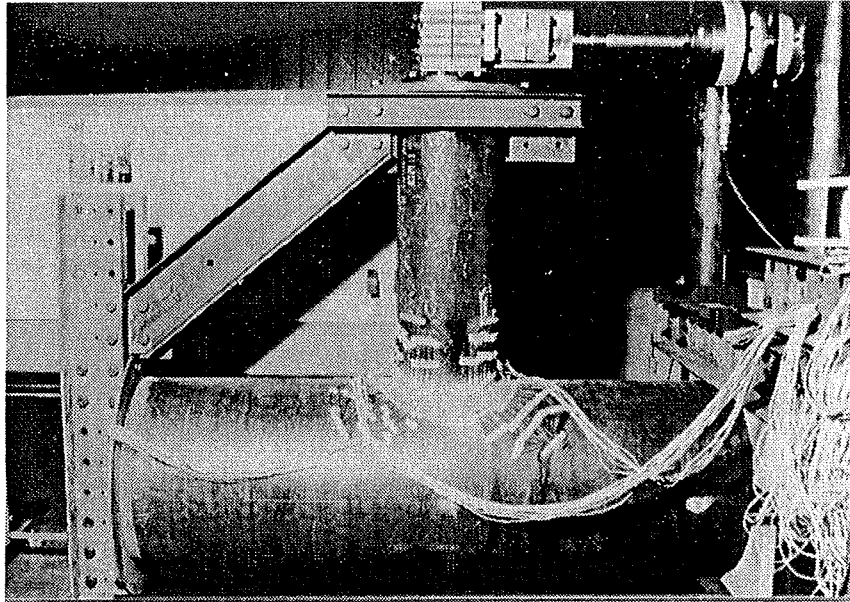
Stiffening arrangement in fatigue tests on tubular joints.
